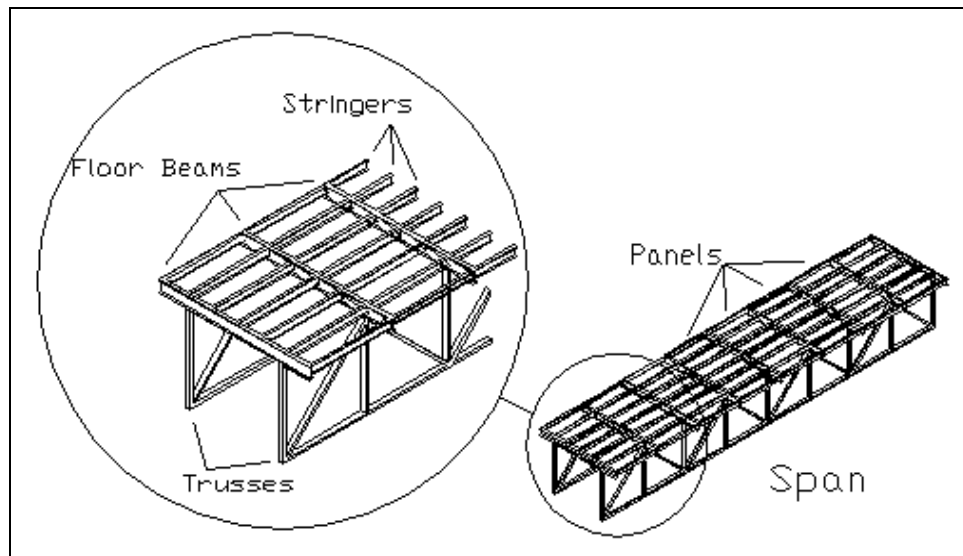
Diagram of one span of the southbound structure of the Winchester Bridge without the six inch concrete deck
